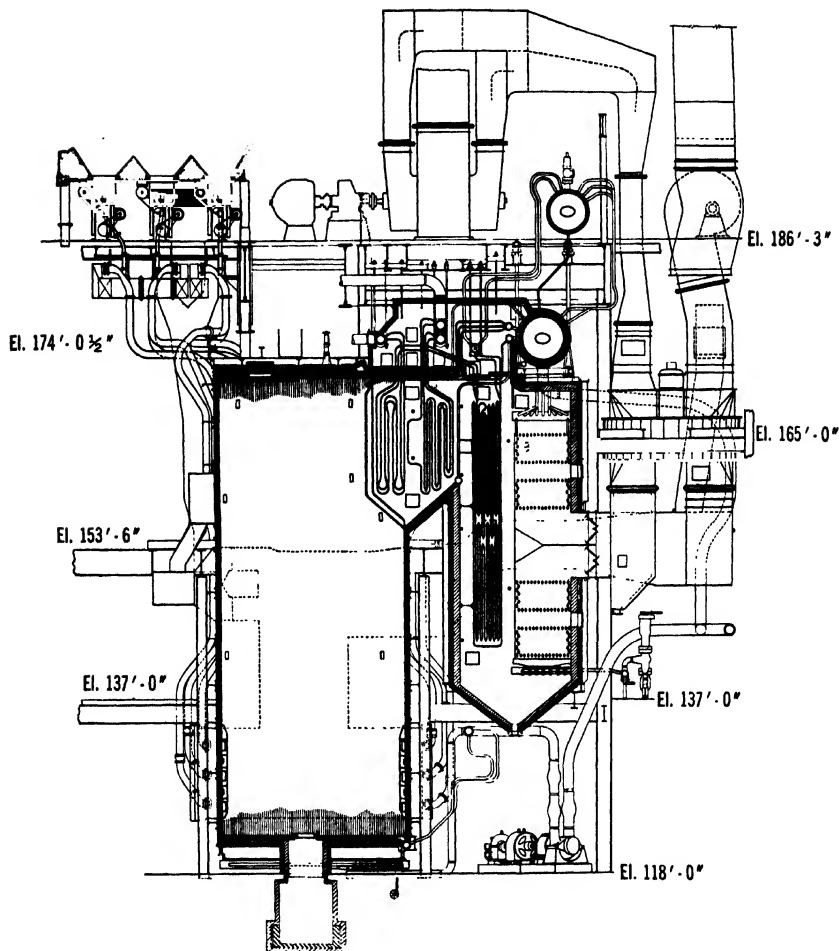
Forced circulation boiler, tangentially fired, auxiliary oil burners. (Courtesy of the Combustion Engineering Company.)
